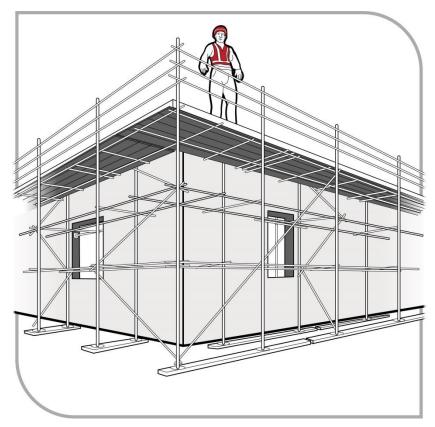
Perimeter scaffold with fully decked working platform, guardrails, mid-rails and toe-boards
